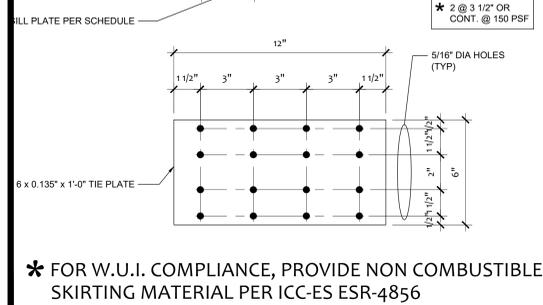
PLATE LAYOUT AT BUILDING PERIMETER SCALE: 3/8"=1'-0" 15
